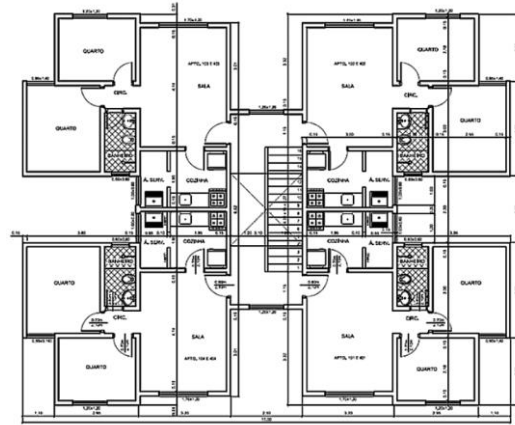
Typical Multi-family Floor Plan with 4 apartments.
